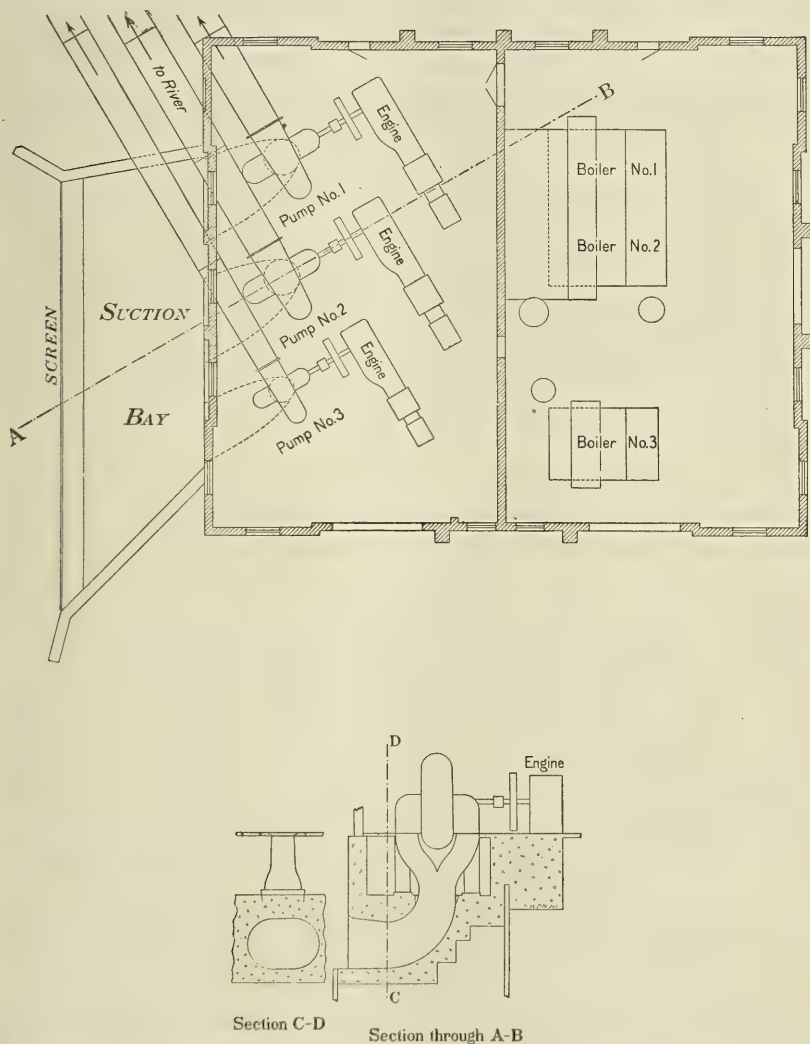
Plan and elevation of pumping plant in Muscatine-Louisa Levee and Drainage District, Iowa.
